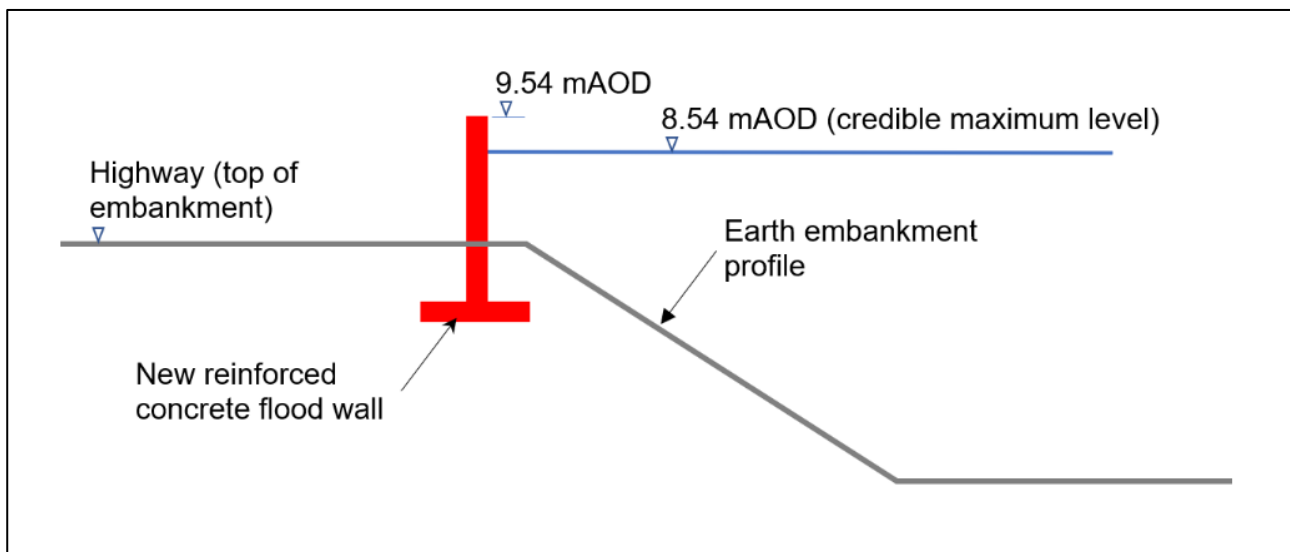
Adaptive works – constructing a reinforced concrete flood wall
